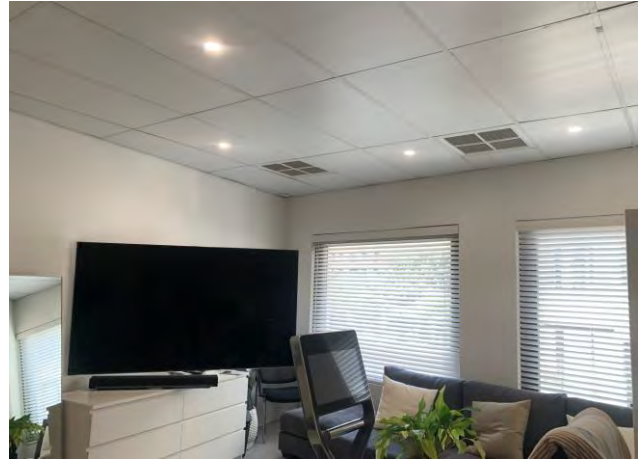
General view to second floor interior. Note: contemporary fitout comprising suspended ceilings and air conditioning vents.
